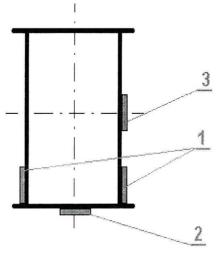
Crossection of the box girder with straps (1 – bottom side strap, 2 – bottom strap, 3 – central strap)
